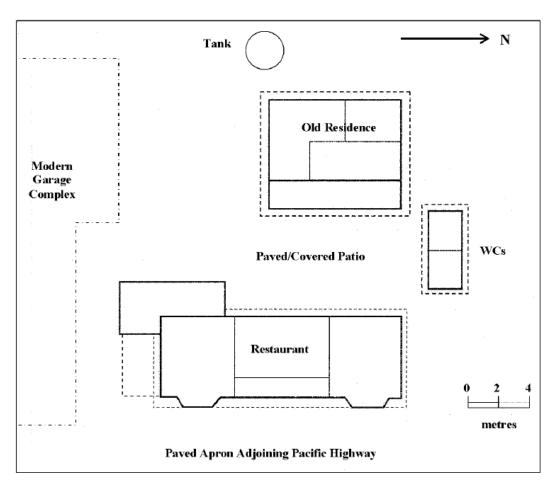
Location plan of buildings at Halfway Creek Service Station Complex (Kuskie and Carter 2007:37).
